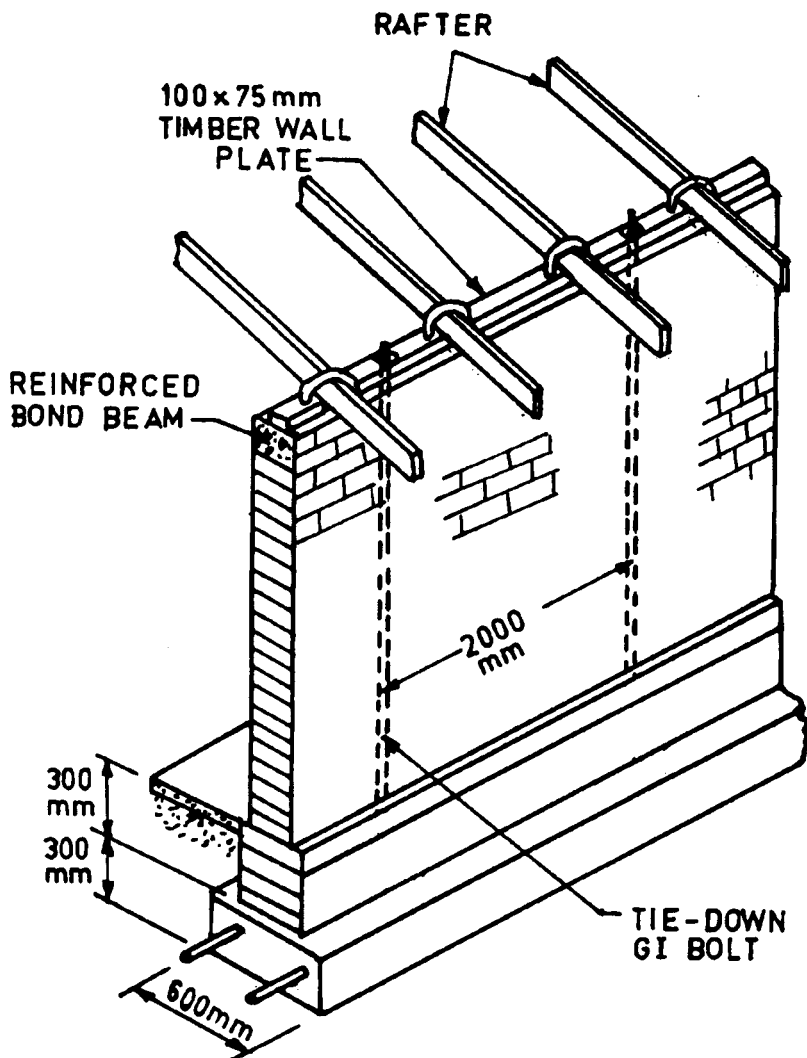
FIXING OF WALLS TO THE FOUNDATION USING TIE-DOWN BOLT
